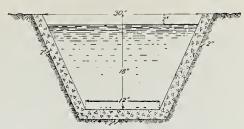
EARTHEN HEAD DITCH LINED WITH CONCRETE
